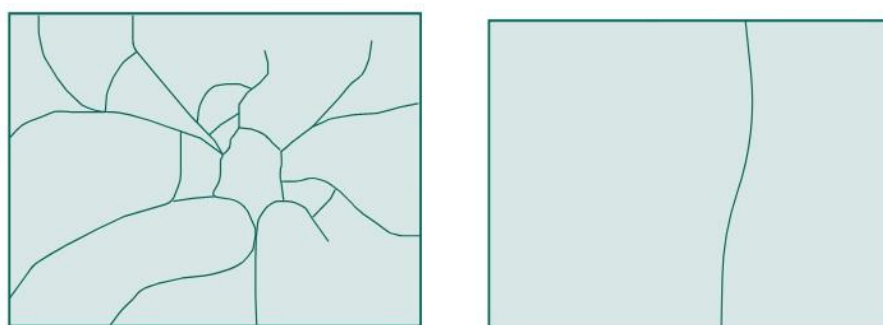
Left - impact on the glass surface; right - torsional crack.
